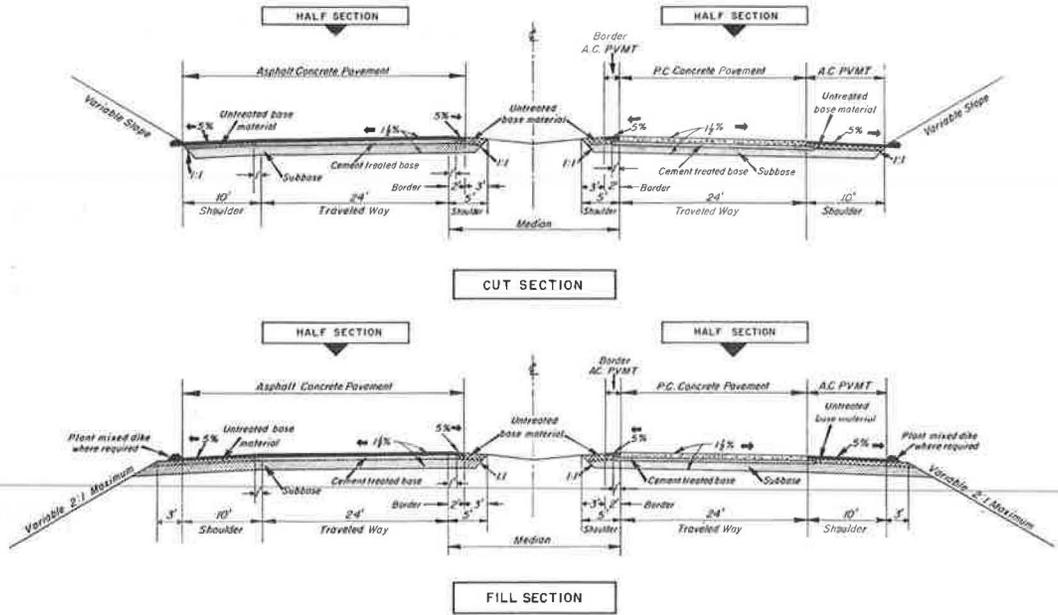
California Division of Highways typical pavement and shoulder design cross-section.
